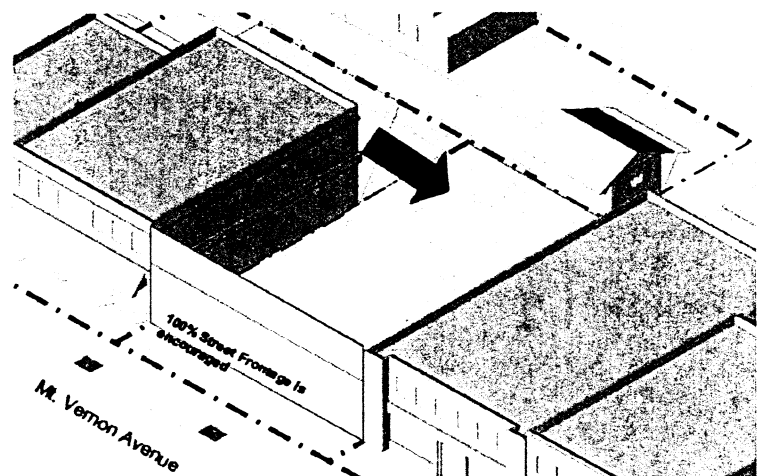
Restrict curb cuts on Mt. Vernon Avenue
